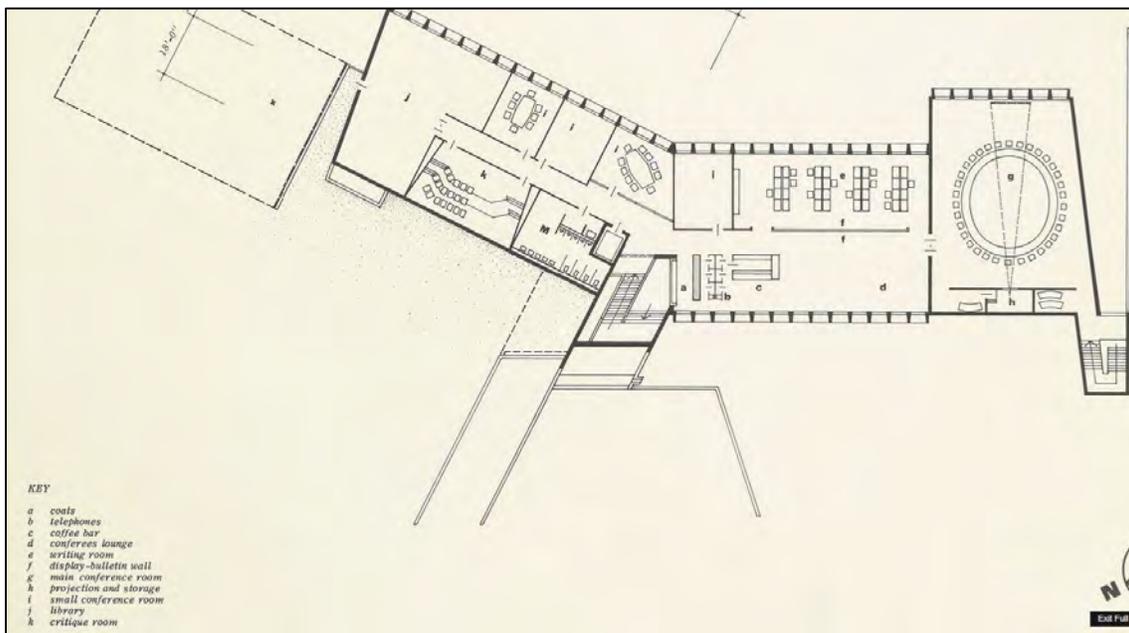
API Upper Story Plan for Original Building (Marcel Breuer Digital Archives)
